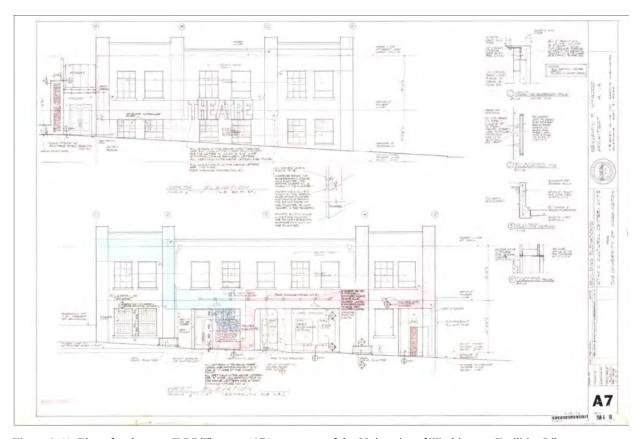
Plans for the new ECC Theater, 1971, courtesy of the University of Washington Facilities Library.
